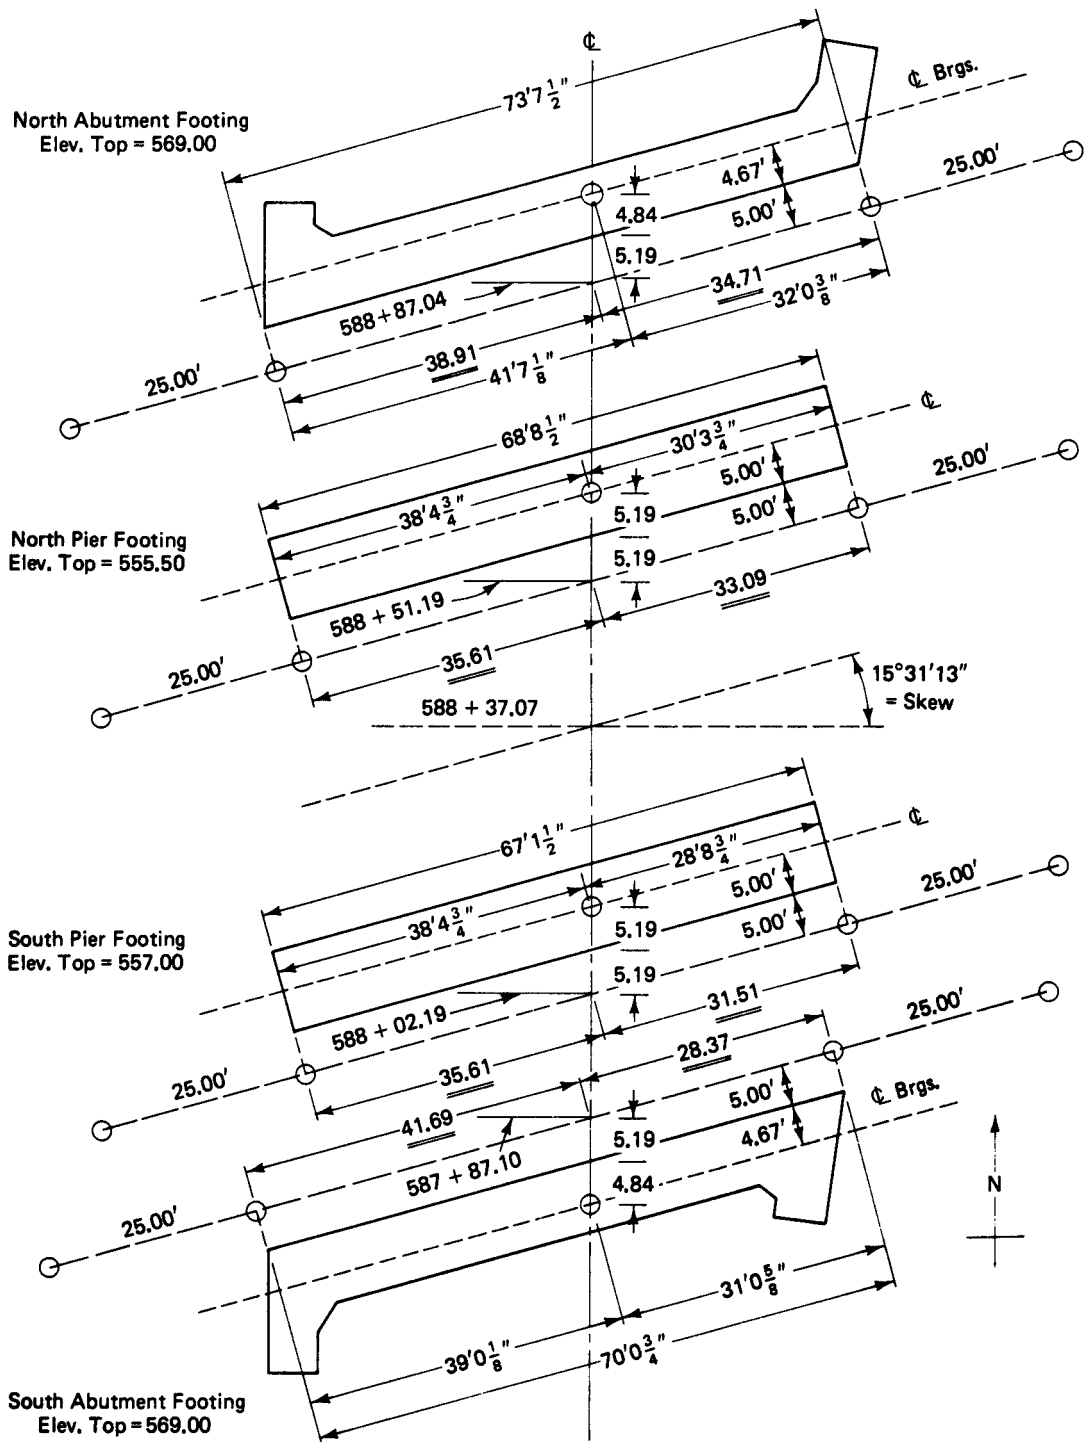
Foundation layout sketch and offsets sketch. Circles shown are CL and o/s layout bars.
